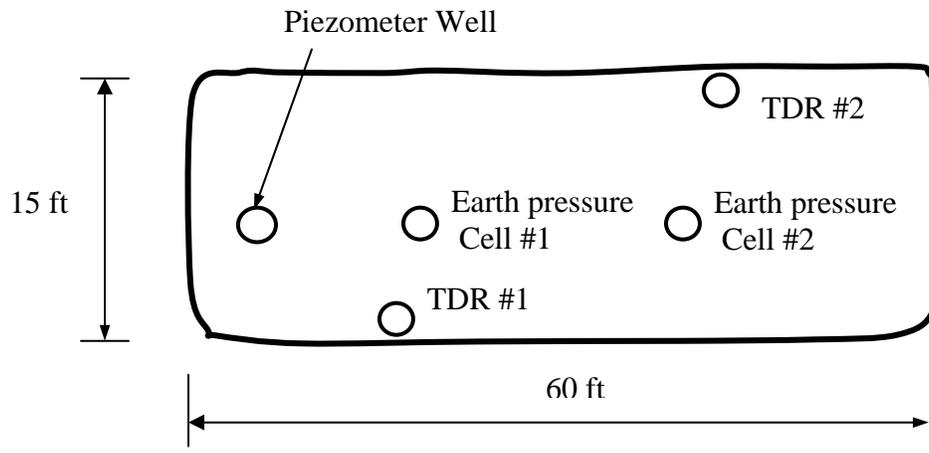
Schematic Sketch of Field Test Site Profile, Lake Worth Site
